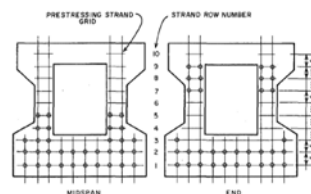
Midspan and End Section of Typical Precast Prestressed Concrete Beam
